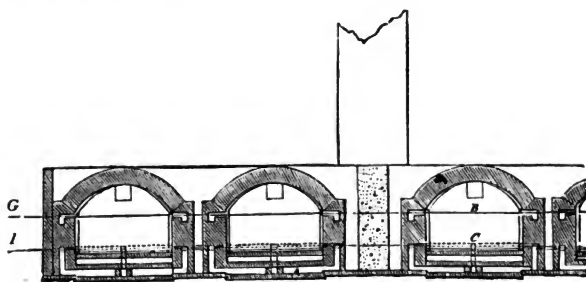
Coke-Oven. Transverse Section at A B, Fig. 90.
